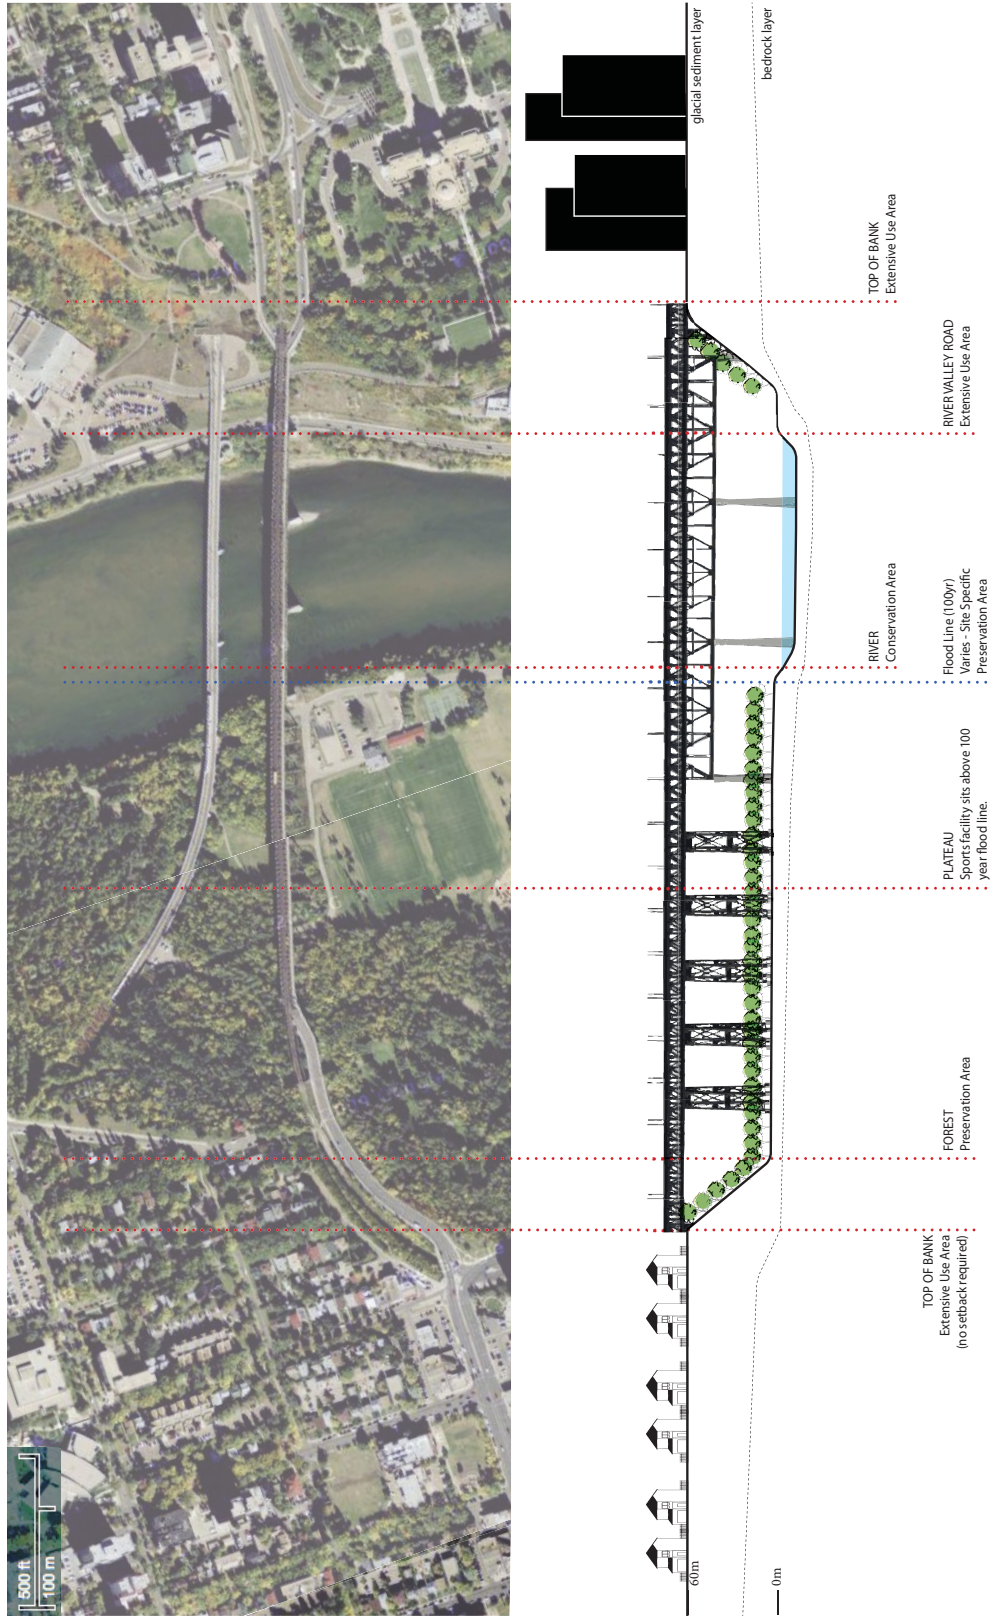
Section "d". High Level Bridge. Edmonton's only top-of-bank to top-of-bank bridge. An excellent example of how roadway infrastructure can be separated from the park system.
